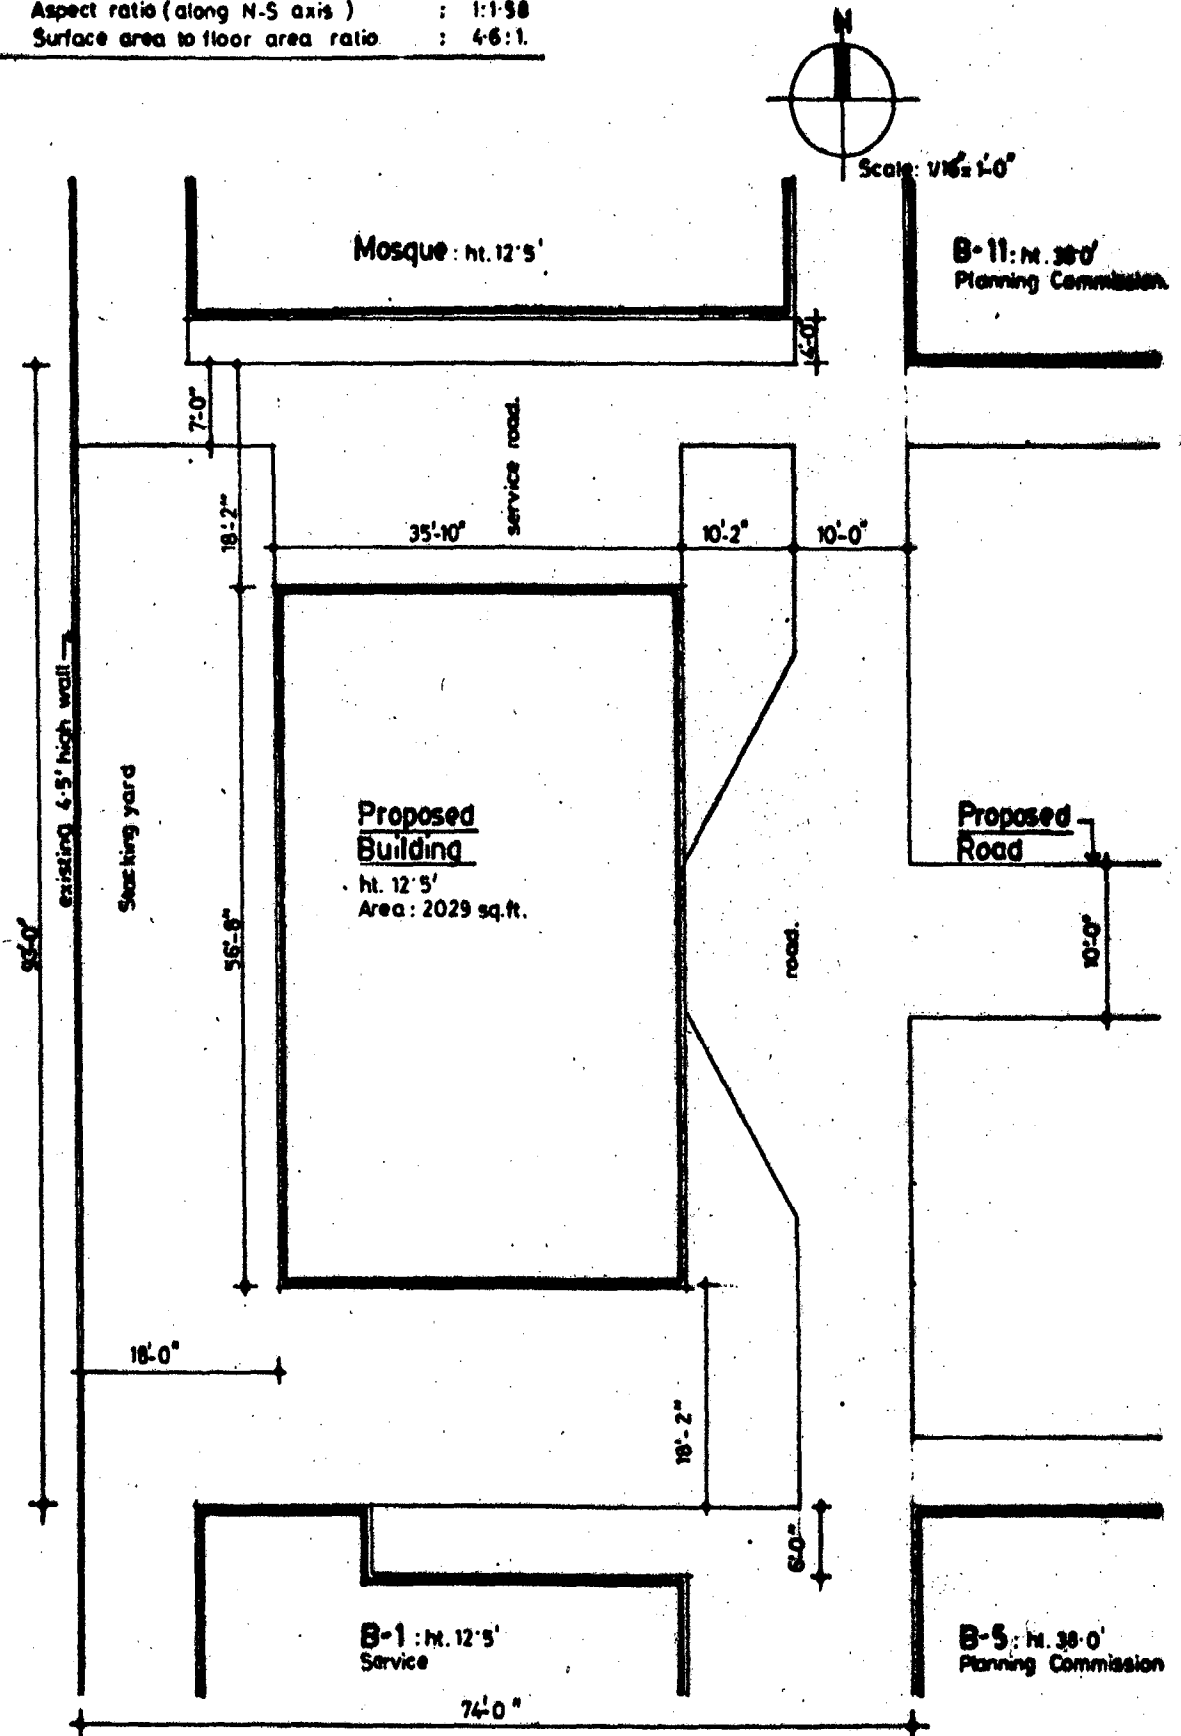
Layout Plan of Proposed SDE's Office at Planning Commission Campus, Dhaka.
